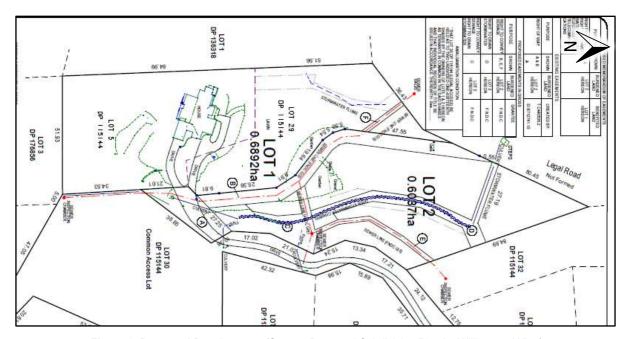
Proposed Development (Source: Proposed Subdivision Plan by William and King)
